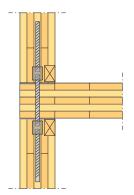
Joint between wall panels and floor slab using fully threaded screws and dowels
